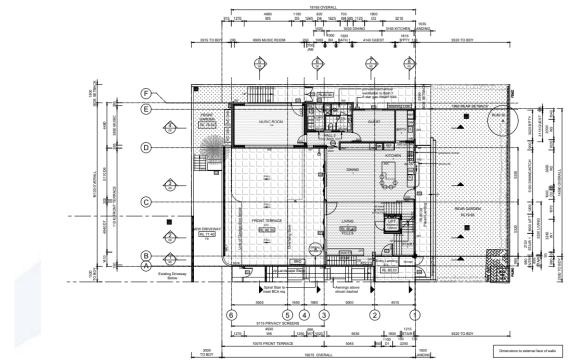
CDC Approved Ground Floor Plan (Not to Scale)
